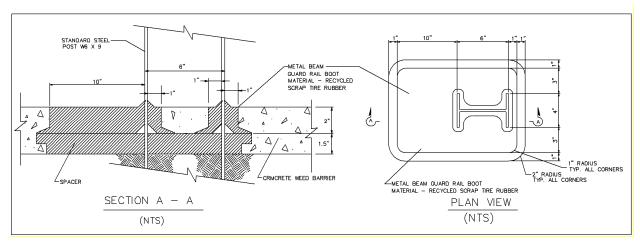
CRMCrete Boot Details for Tests 656 and 657
